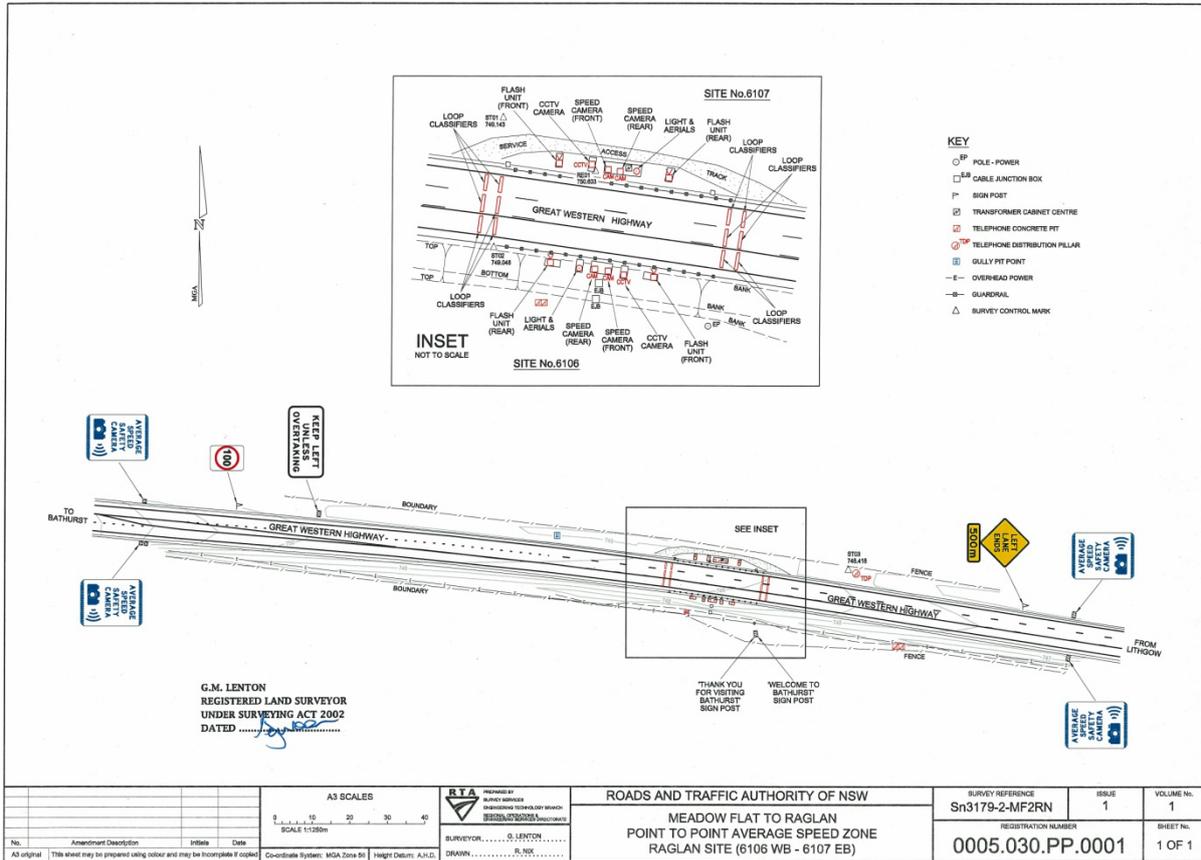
Detail survey plan for the Raglan site (Great Western Highway).
